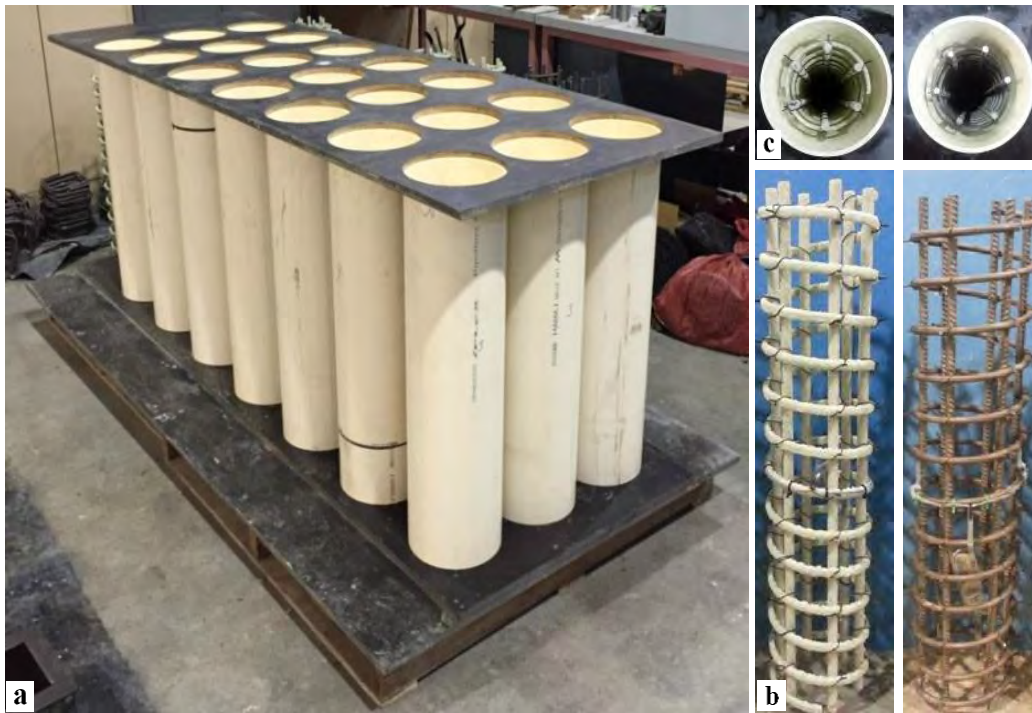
Specimen Fabrication: (a) PVC molds and the wooden formwork; (b) steel and GFRP cages and (c) GFRP and steel cages inside the PVC molds
